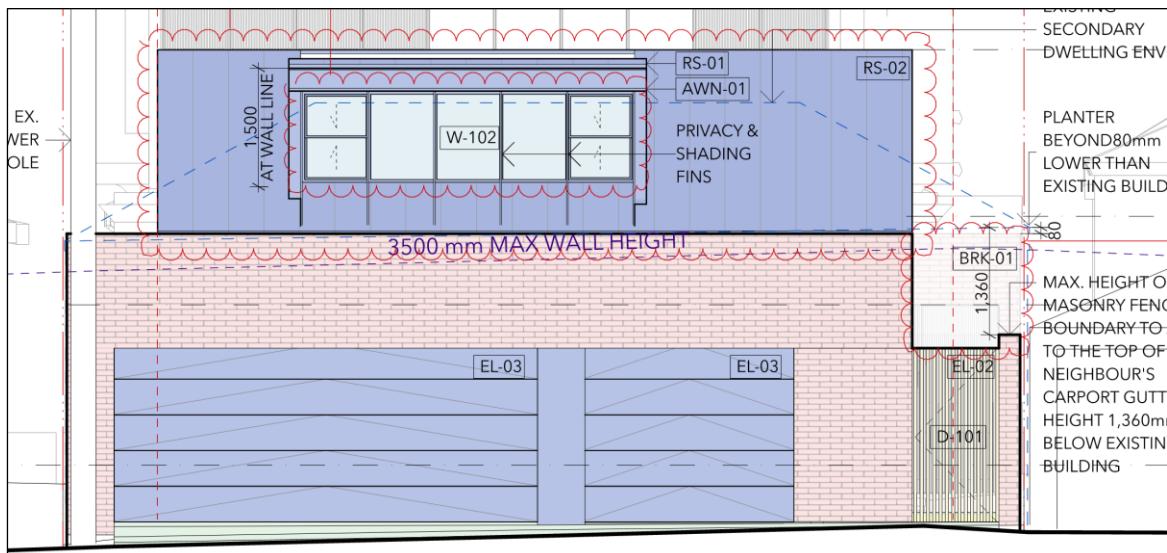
Proposed South East Elevation – DA/165/2023/B
